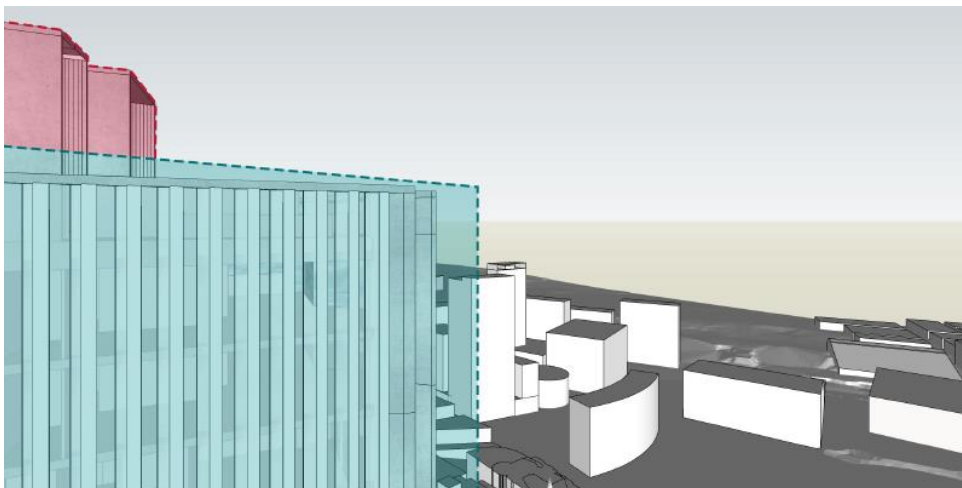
View E.1 - View Perspective from apartment at Level 46, approved building envelope identified in blue, amended envelope outlined in red
